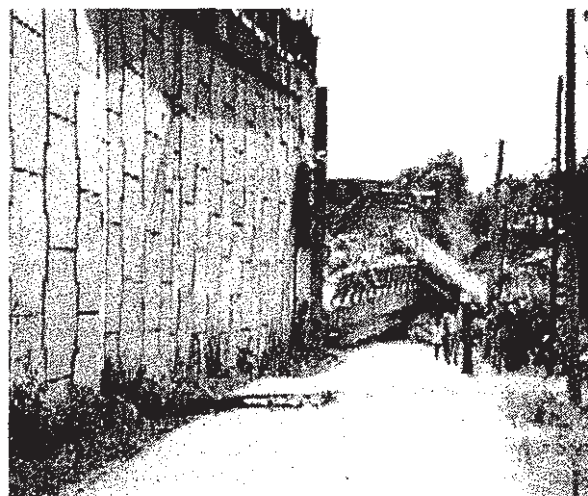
Arifiye Reinforced Earth ramp wall. Photo Asheim & Mander, EERI.
